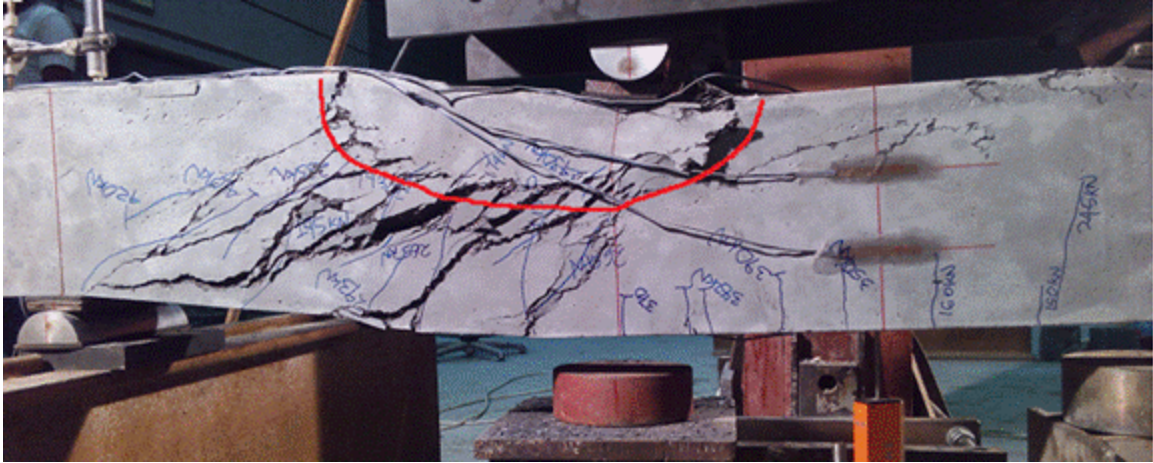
Unloaded post-failure deformed configuration of SB-3.1-UMSN, showing heavy shearing and bearing damages.
